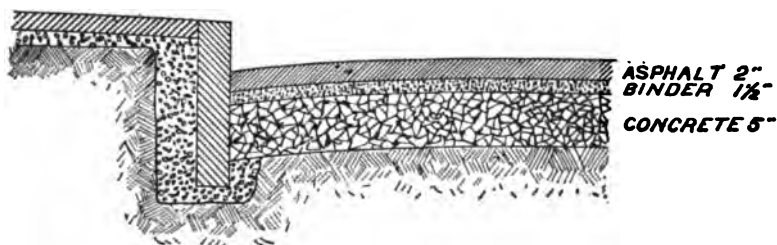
HEAVY-TRAFFIC PAVEMENT.
